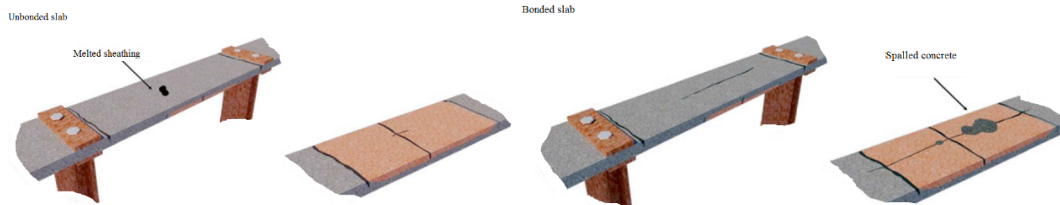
Exaggerated schematic of slab damage after first heating for each slab (crack widths $<1 \text{ mm}$).
